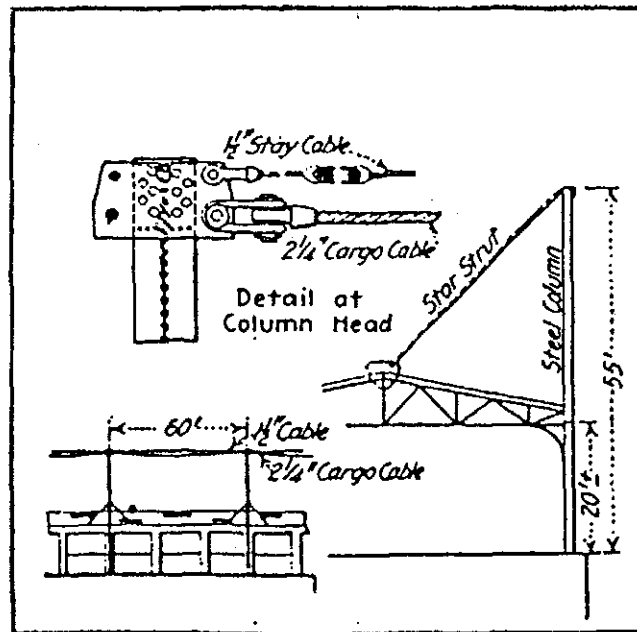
WEST 56th STREET PIER CARGO MAST DETAILS
